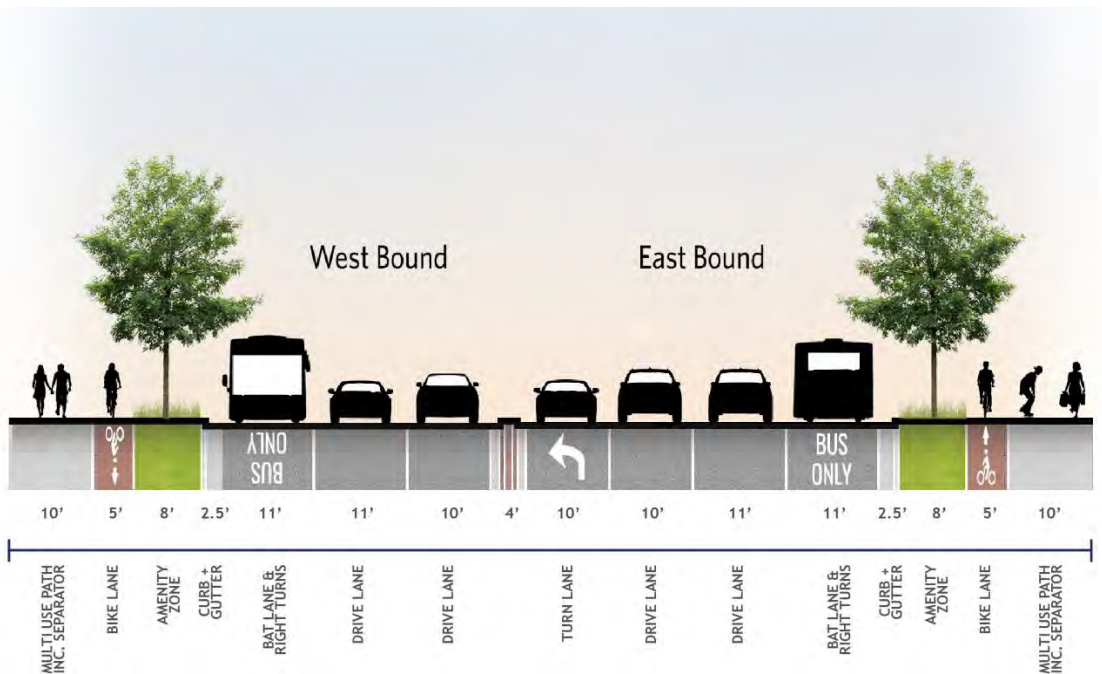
East Arapahoe Avenue street section at 55th Street as described by the CO 7 Project. Section depicts four general purpose travel lanes, a center turn lane, outside transit lanes, as well as a landscape buffer with trees, an off-street bike lane and multi-use paths on both the north and south sides of the street.
